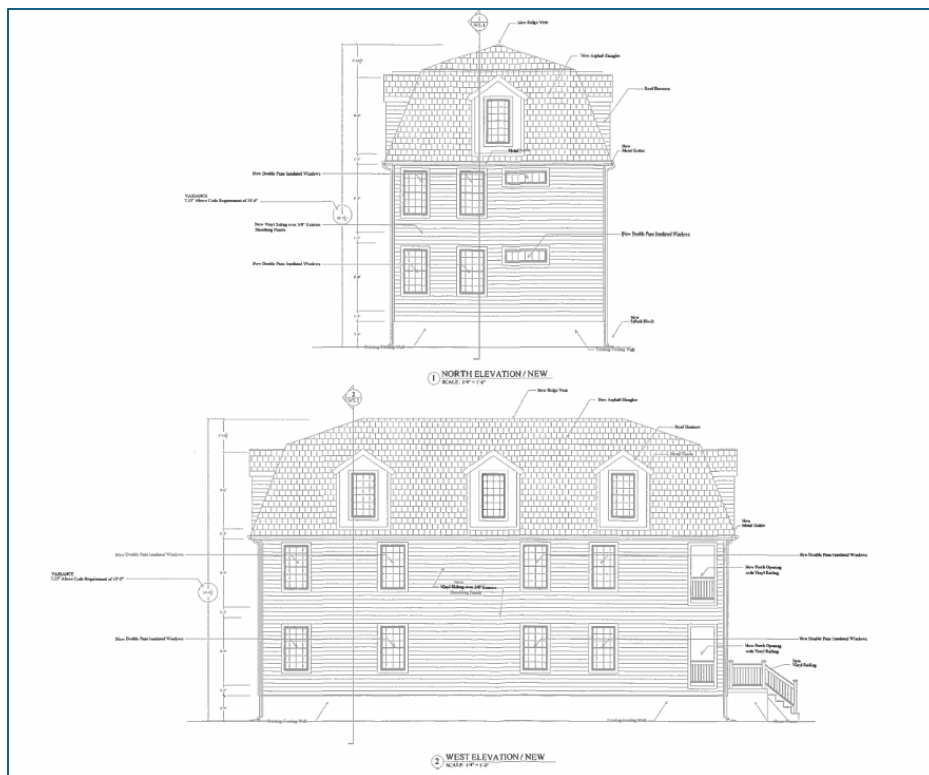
Elevation of Dwelling with Gambrel Roof Presented to BMZA in Appeal No. 2024-272
